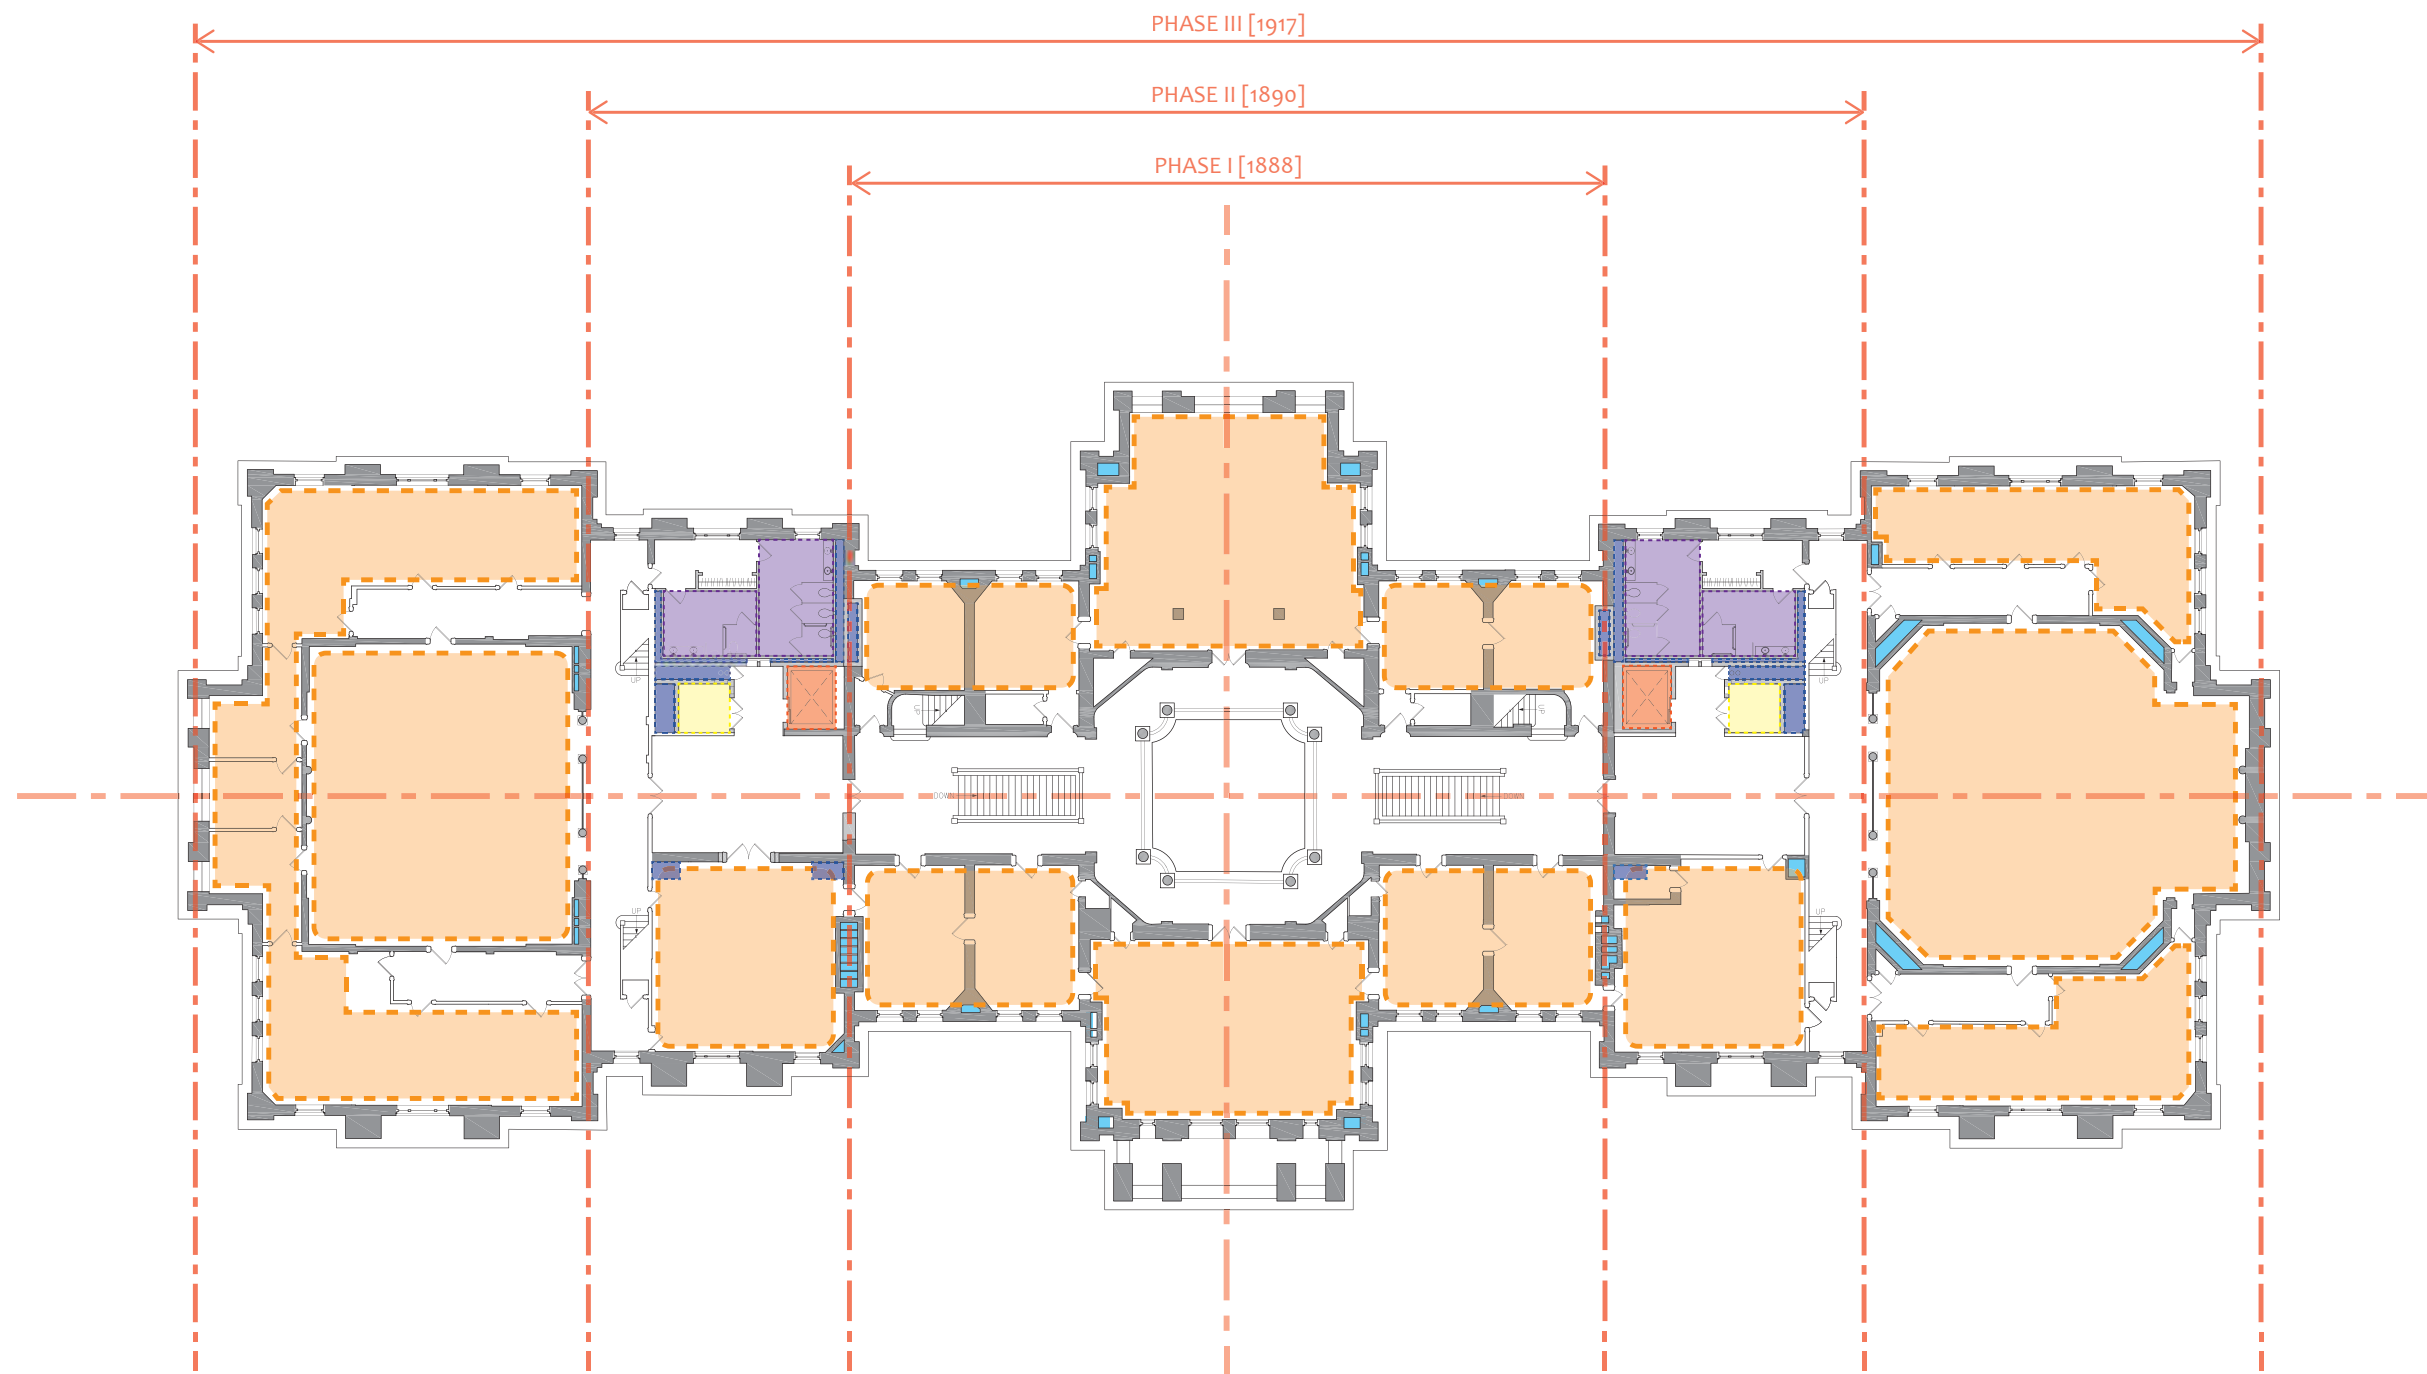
First Floor Level Plan, Illustrating the Potential Space Use of the Capitol Building.
